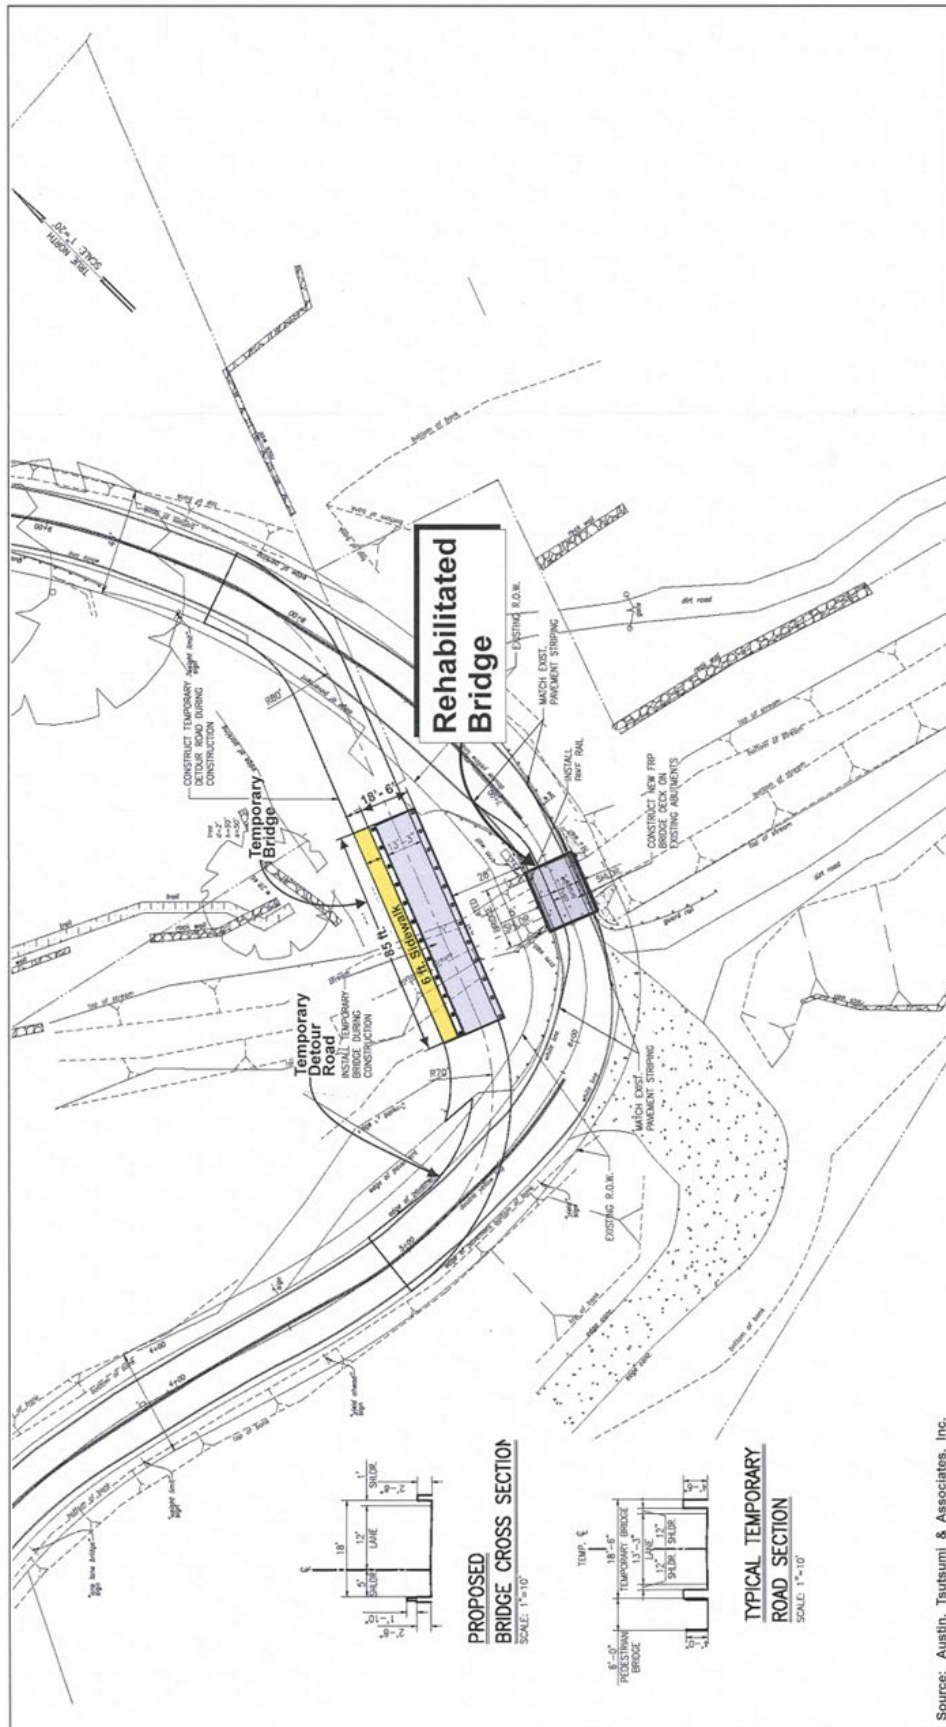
Conceptual Bridge and Detour Road Layout Plan
